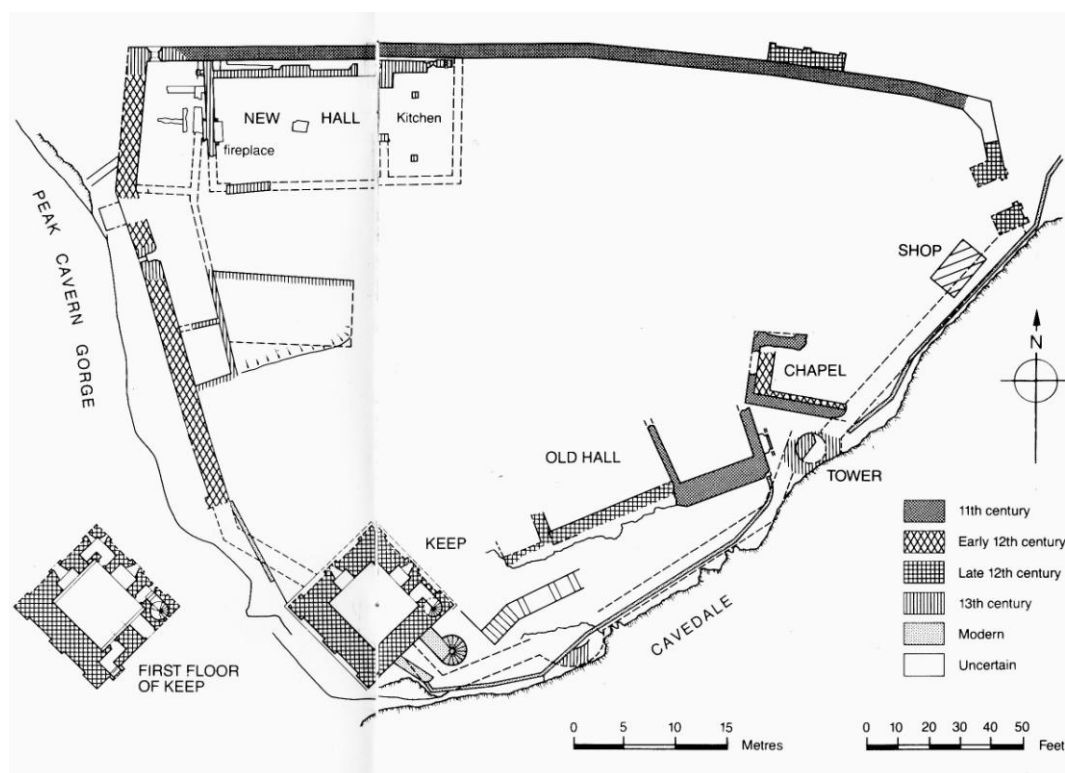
Peveril Castle: Site Plan of the Inner Bailey.
